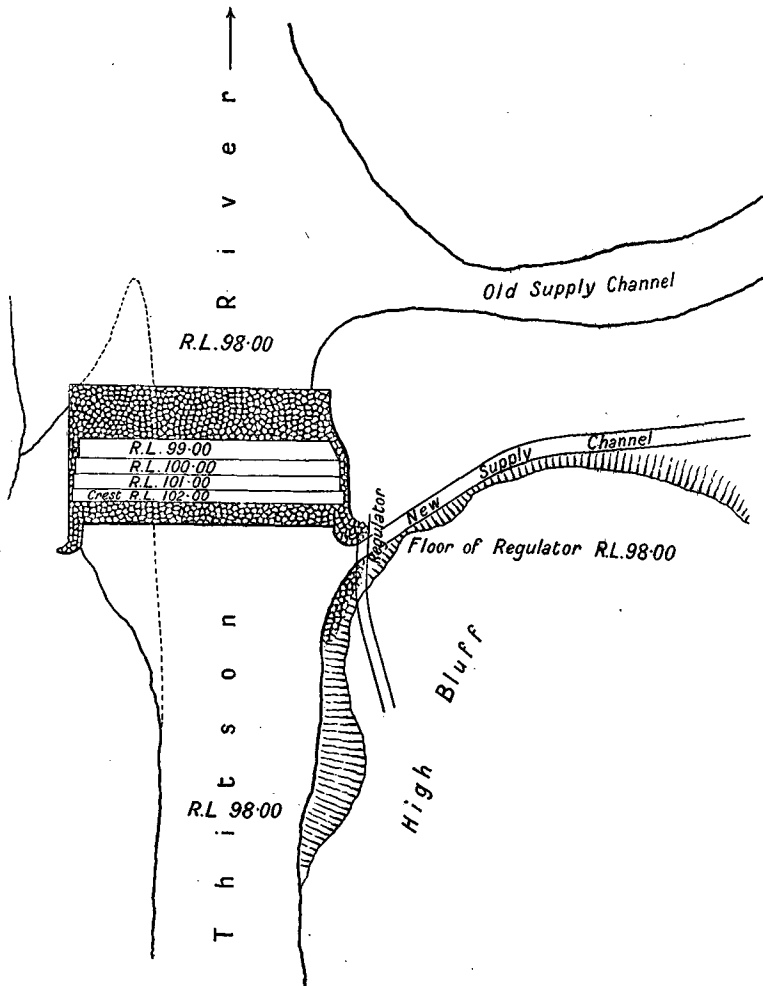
Site Plan, Tennyetkon Crib Weir.
